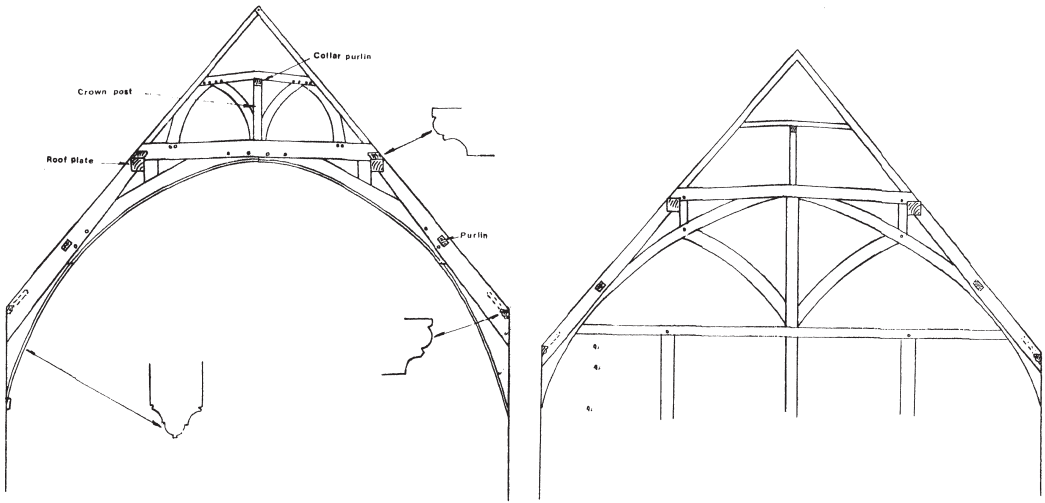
Base-cruck trusses in the open hall of 15 Fore Street, Taunton. Left: central truss, right: closed truss at end of hall. From Williams and Gilson 1981 (note 7)
